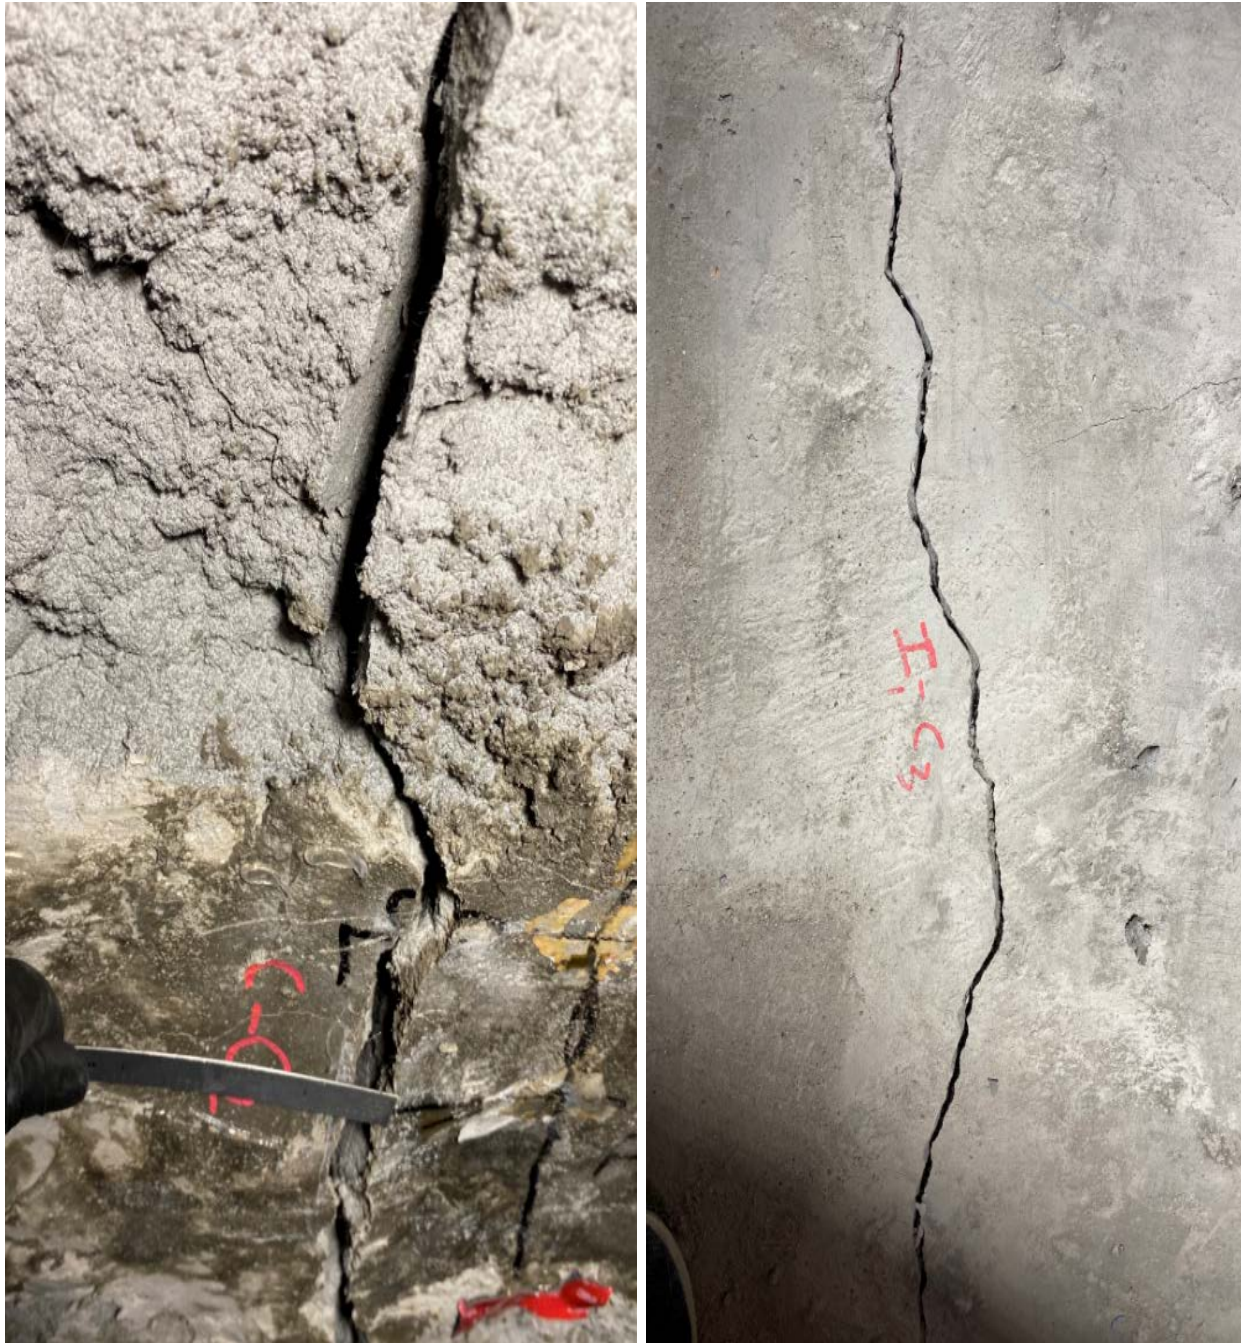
Longitudinal cracks on the circular CMP at: (left) crown, and (right) invert of the SAPL.
